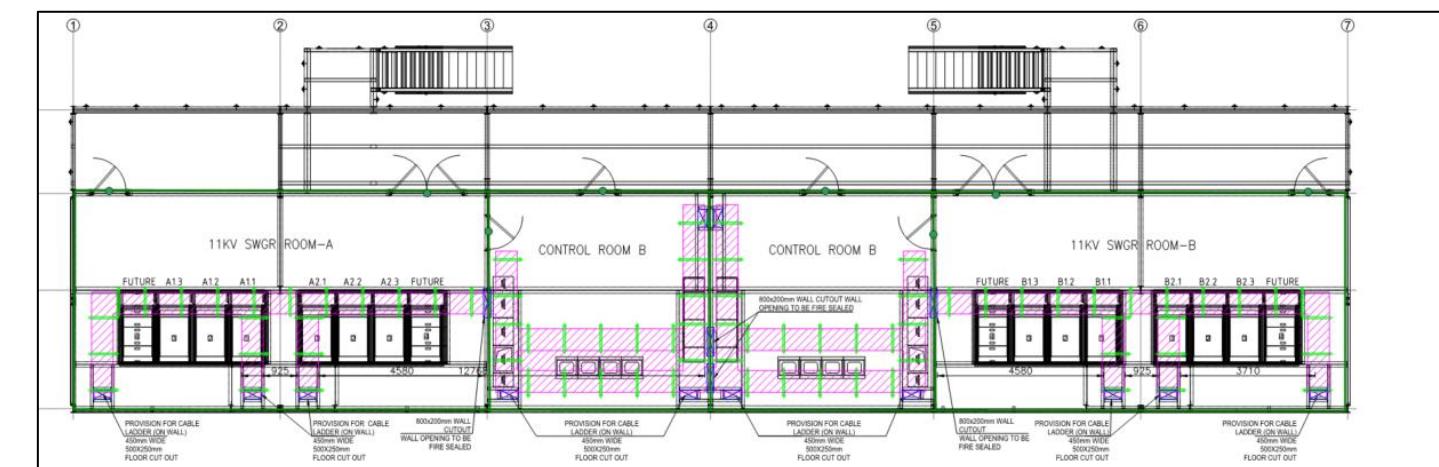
Plan Drawing of fire resistance HV Substation First Floor
